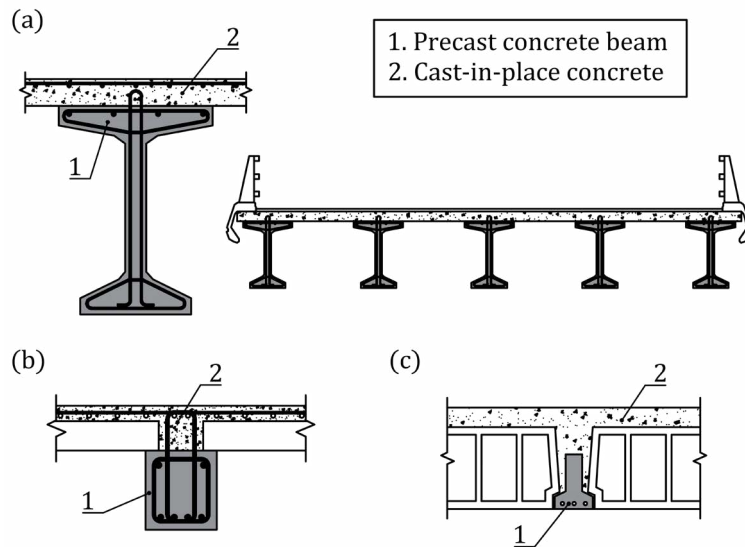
Examples of concrete composite structures: (a) Bridge deck made of precast beams with top cast-in-place concrete; (b) Connection of precast beam and hollow-core slab filled with cast-in-place concrete; (c) Beam-and-block floor.
